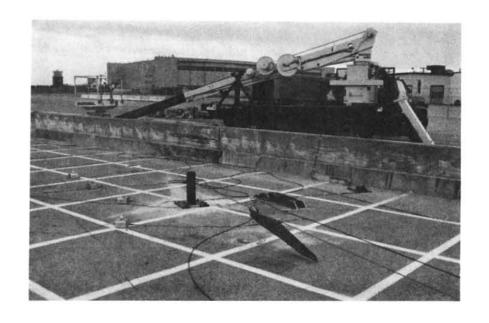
RETROFIT CONCRETE BARRIER RAIL DAMAGE, TEST 12-1
